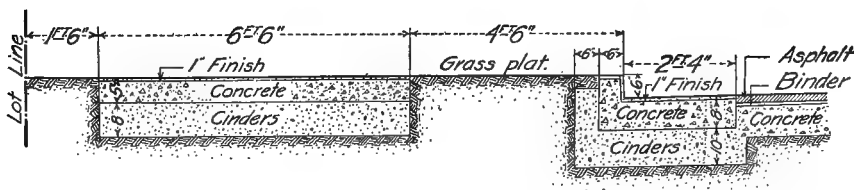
CROSS SECTION OF SIDEWALK AND COMBINED CURB AND GUTTER.
